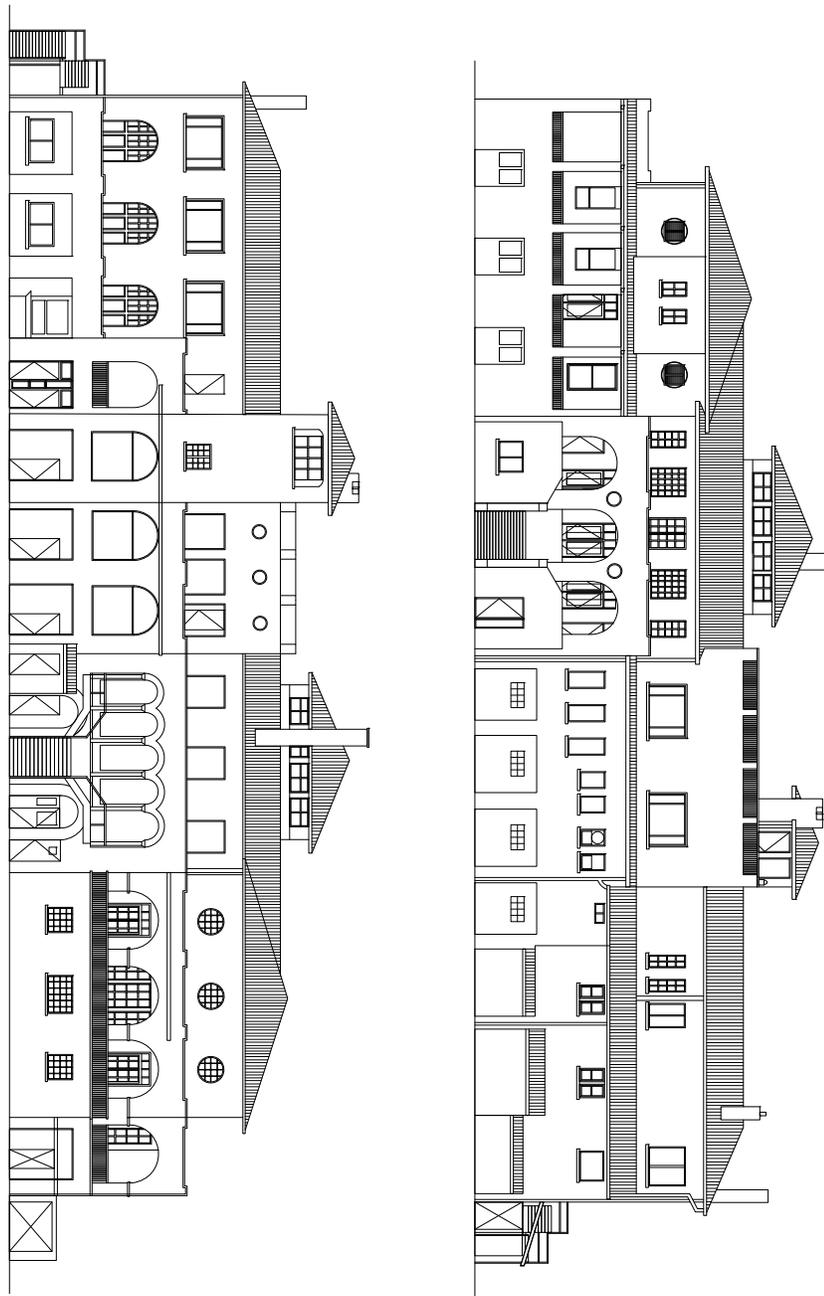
Detroit Boat Club, North and South Elevations, Existing, 2014 (Based on Hamilton Anderson Associates' 1997 drawings) (Author)
